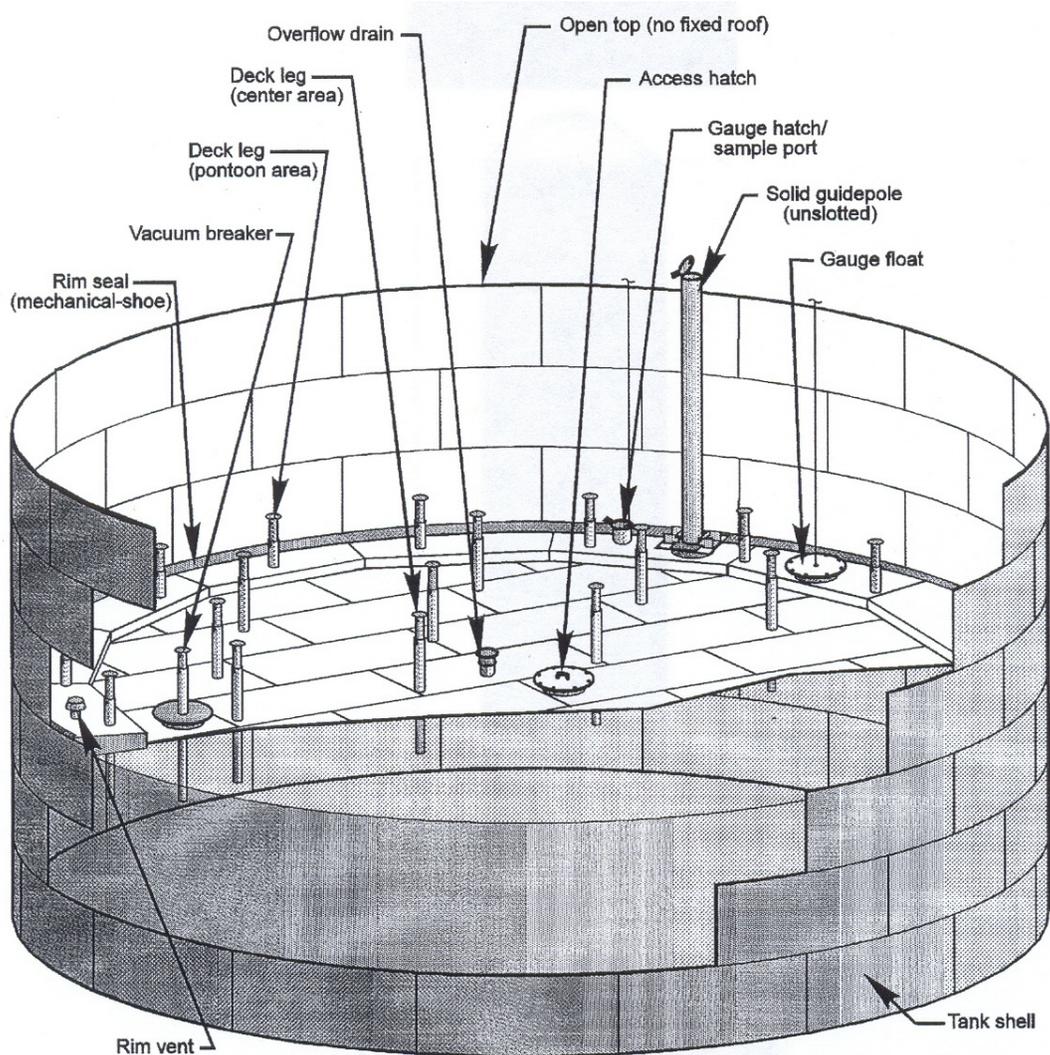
External Floating Roof Tank (source: U.S. EPA)
